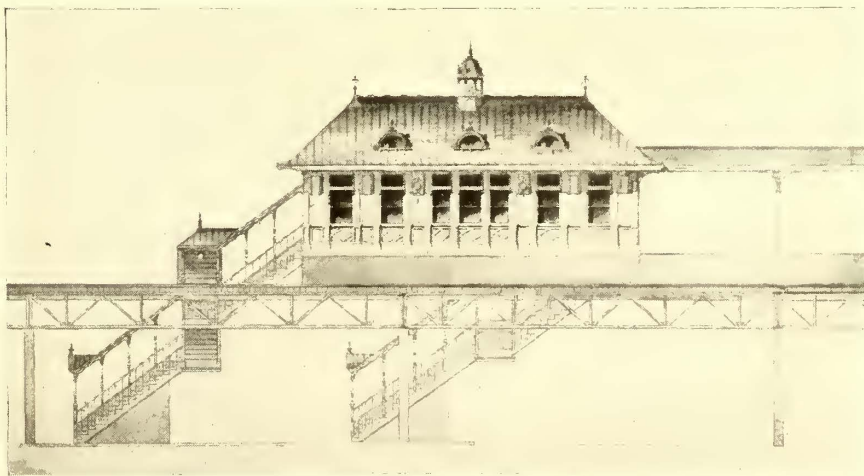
DESIGN FOR ELEVATED RAILWAY STATION
